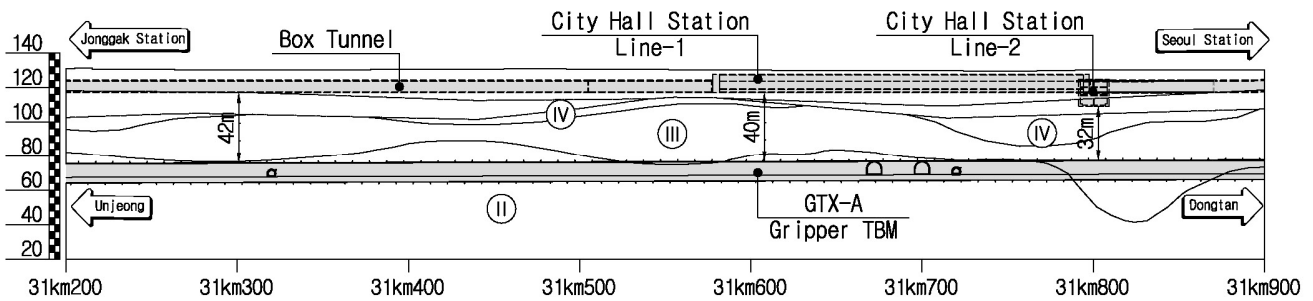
Longitudinal view of tunnelling (GTX-A) under Reinforcement plan based on proximity evaluation
